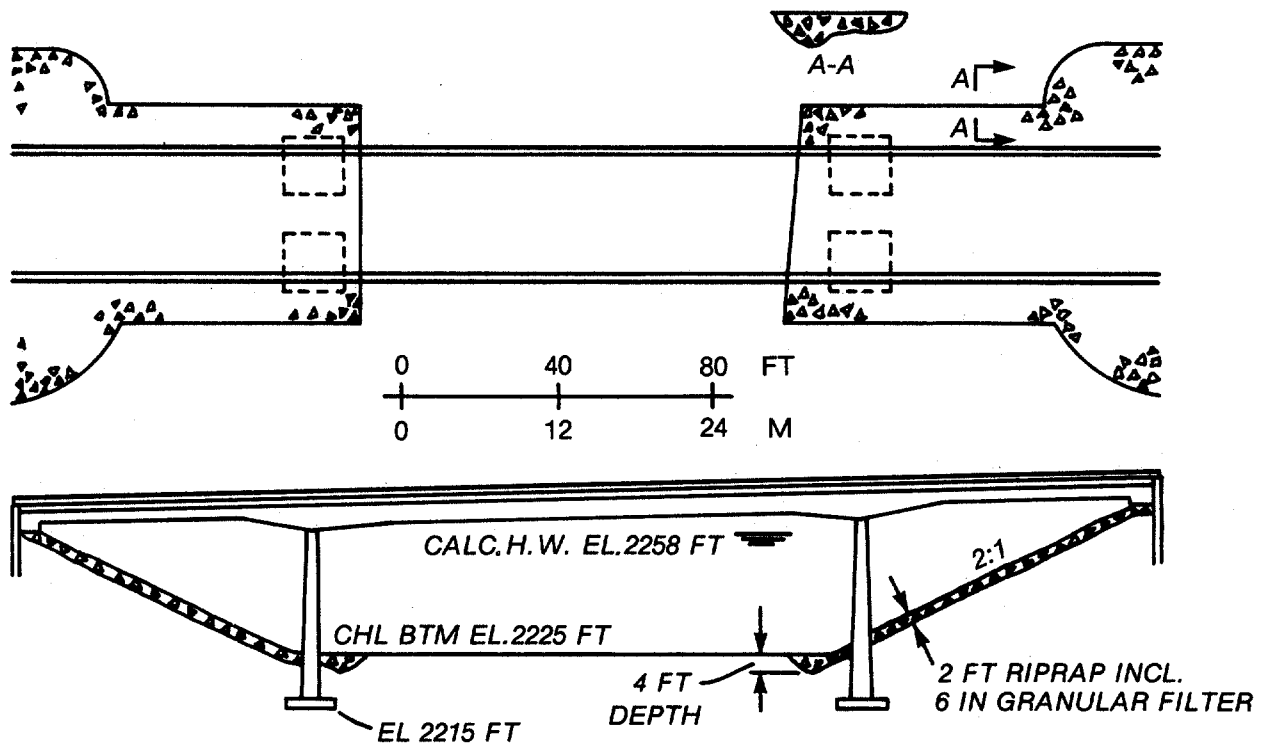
Plan and elevation sketch showing design features and countermeasures at new SR-49 bridge, built about 1970.
